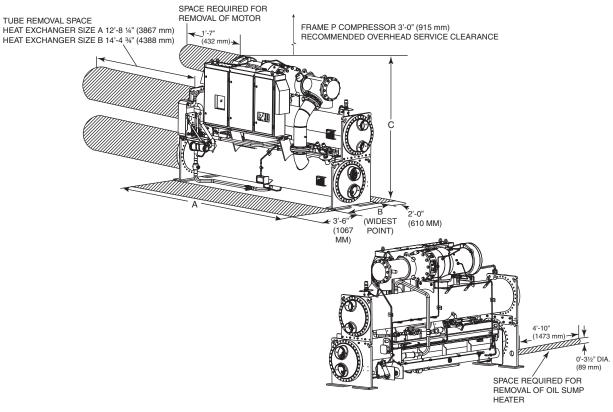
23XRV Heat Exchanger Sizes A,B Dimensions (Unit with P Compressor Shown)
